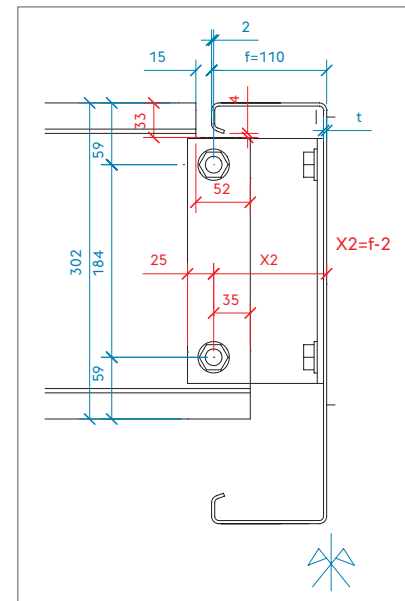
Example of a connection of a floor beam made of 302C+20 to a girder made of 402C+25
